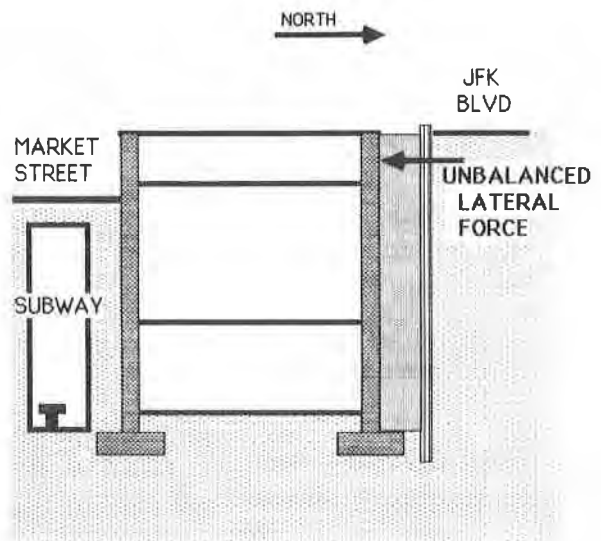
UNBALANCED LATERAL FORCE AGAINST PLAZA NORTH WALL
